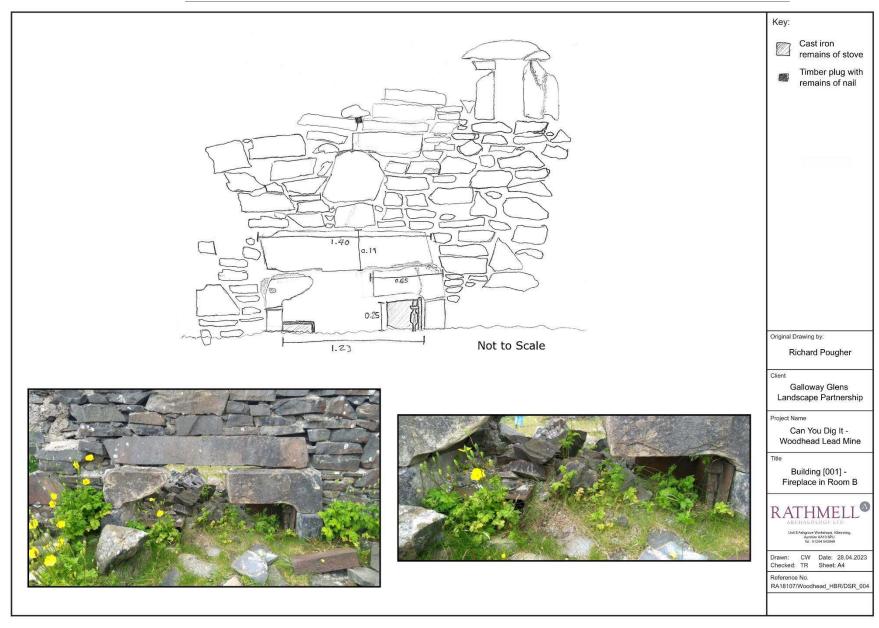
Fireplace in the southwest wall of Room B, Building [001]
